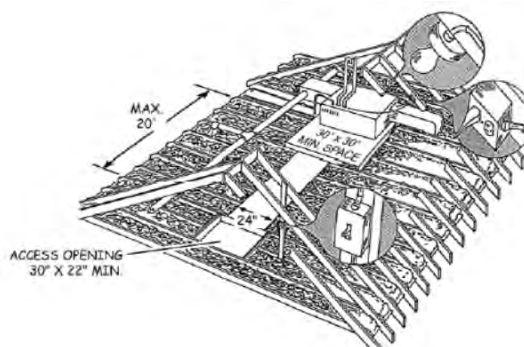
ATTIC LOCATION REQUIREMENTS
